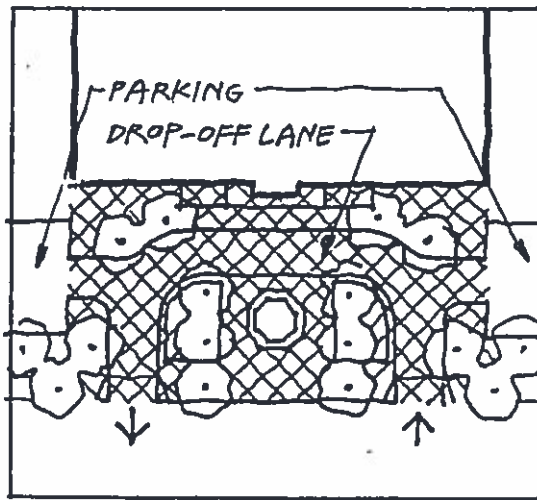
A ONE EXAMPLE OF A DROP-OFF LANE BETWEEN THE BUILDING AND STREET
